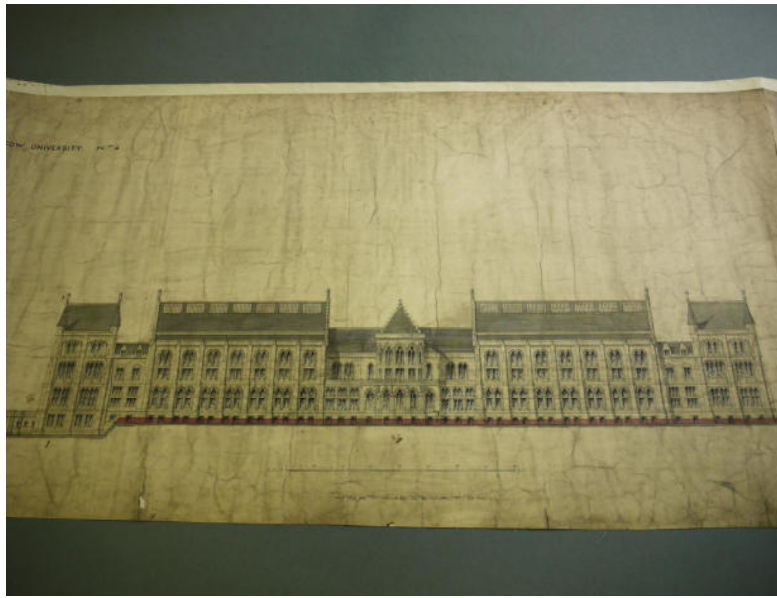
The University building North Elevation plan, c.1867, ref. BUL6/1/18, the image shows plan condition before cleaning process. Photograph by Ela Gorska-Wiklo.
